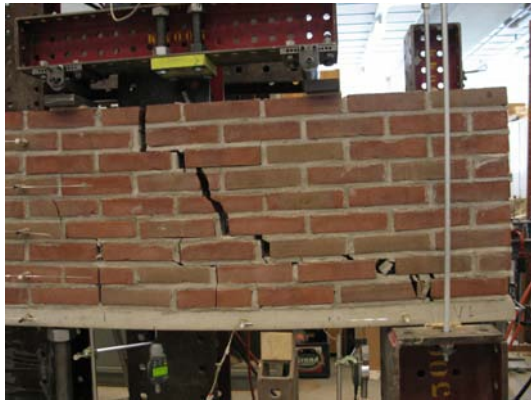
Example of a cracked wall, indicating shear near the support in the joint between lintel and masonry.
